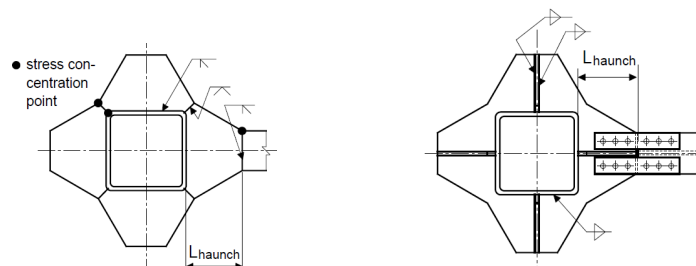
Beam-to-column connections with external diaphragms [51]
